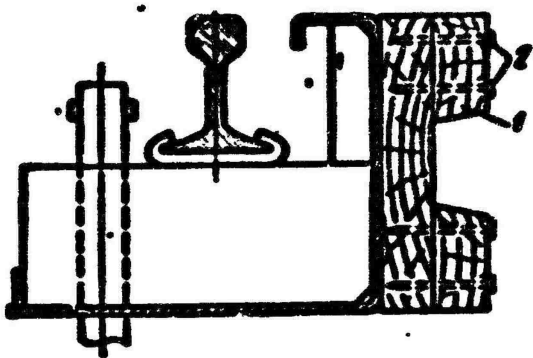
A molding form placed to the side of paving forms for forming longitudinal joints with the groove. 1) boards; 2) nails.
